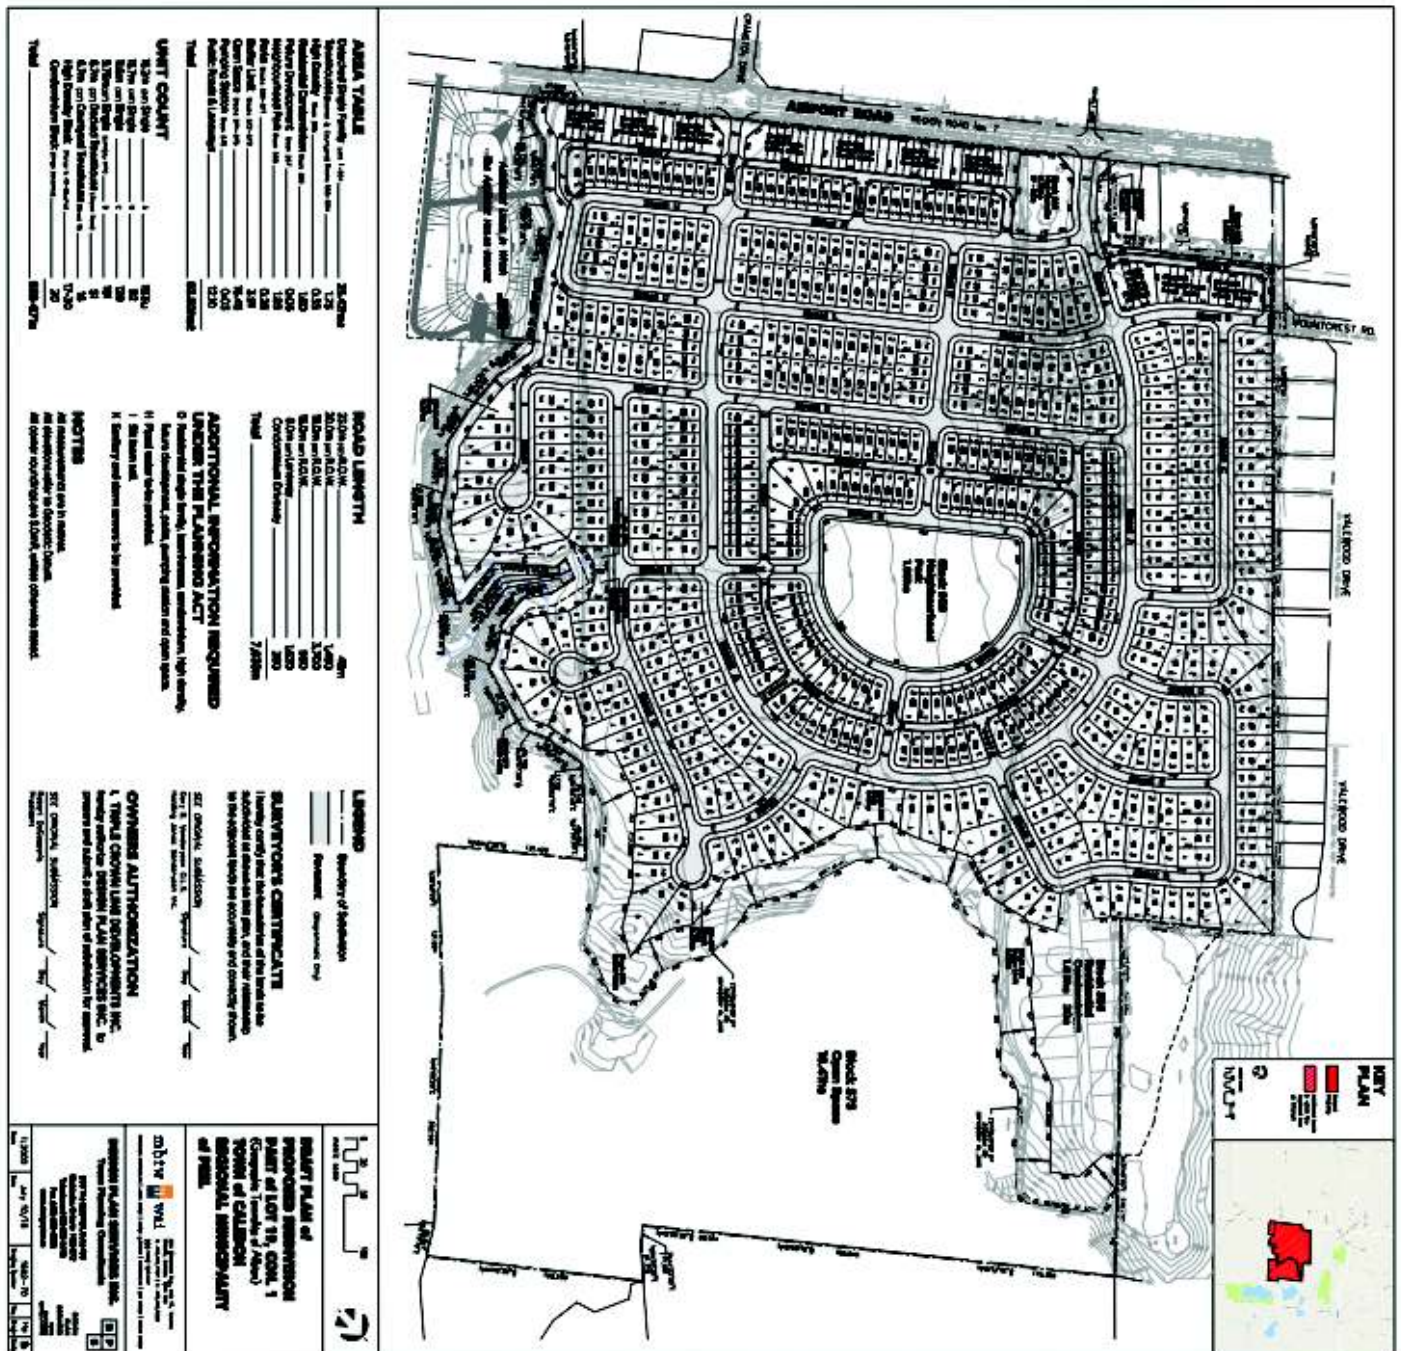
Proposed Conceptual Draft Subdivision Plan
